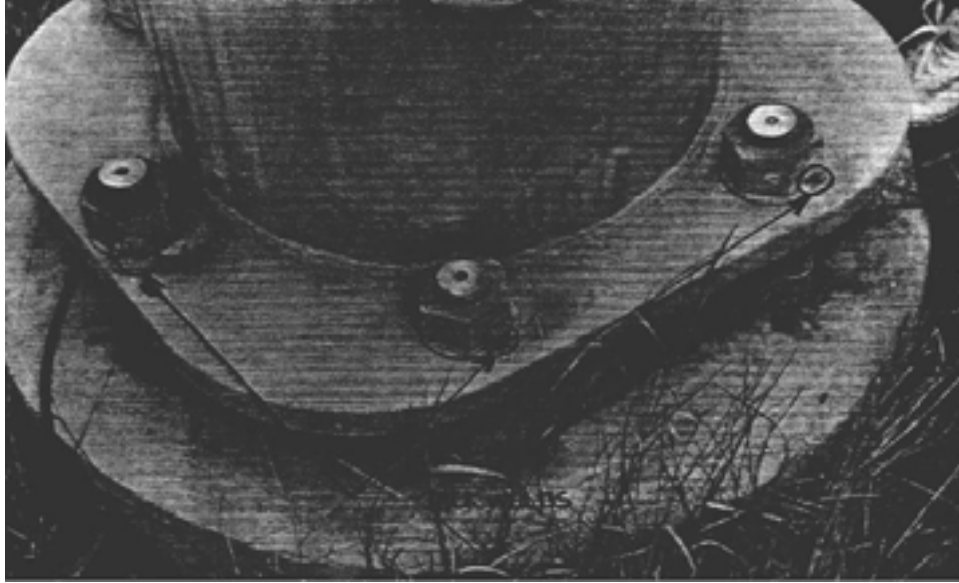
Tack Weld on Anchor Bolt Nut
